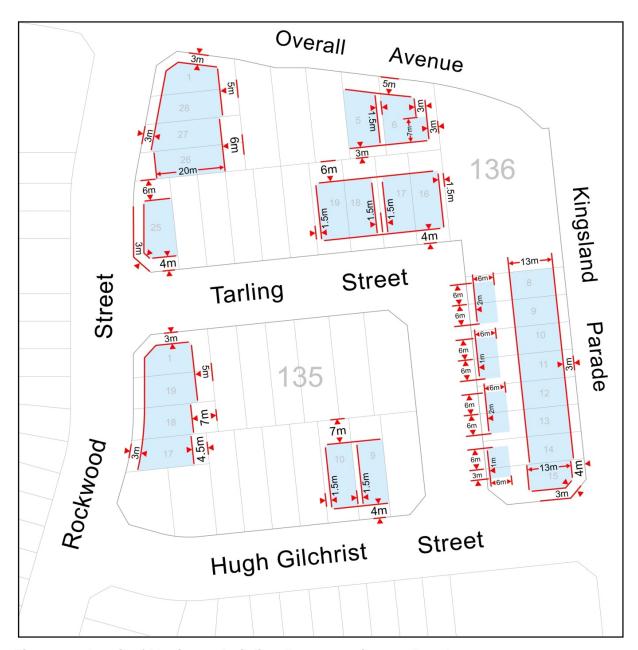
Detail of Maximum Building Zone - sections 135 and 136
